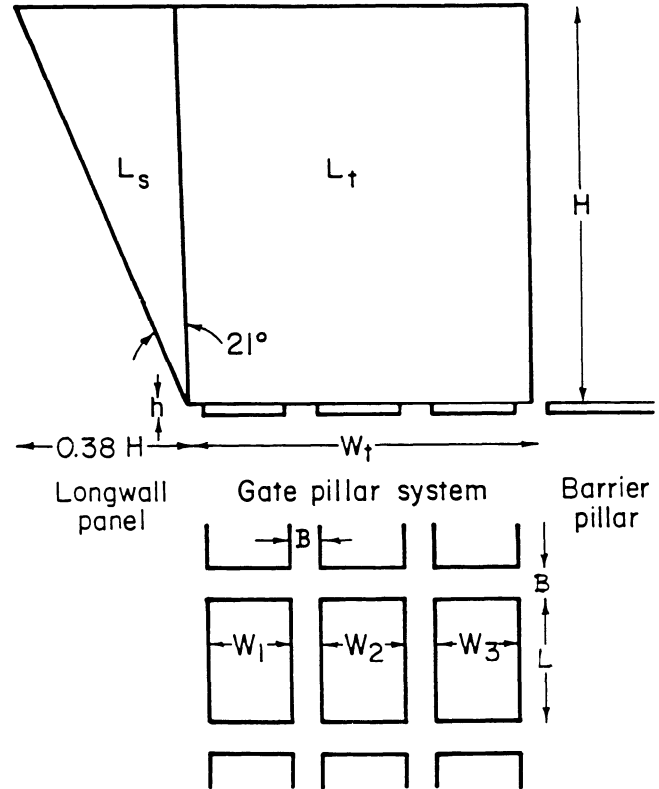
Definition of geometric parameters used in the analysis of longwall pillar stability (Mark and Bieniawski, 1986).
